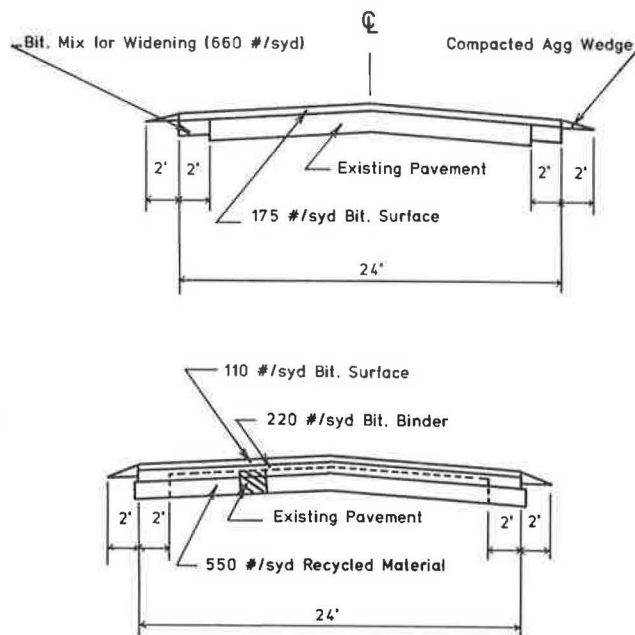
Typical cross sections: *top*, resurfaced pavement; *bottom*, recycled pavement.
